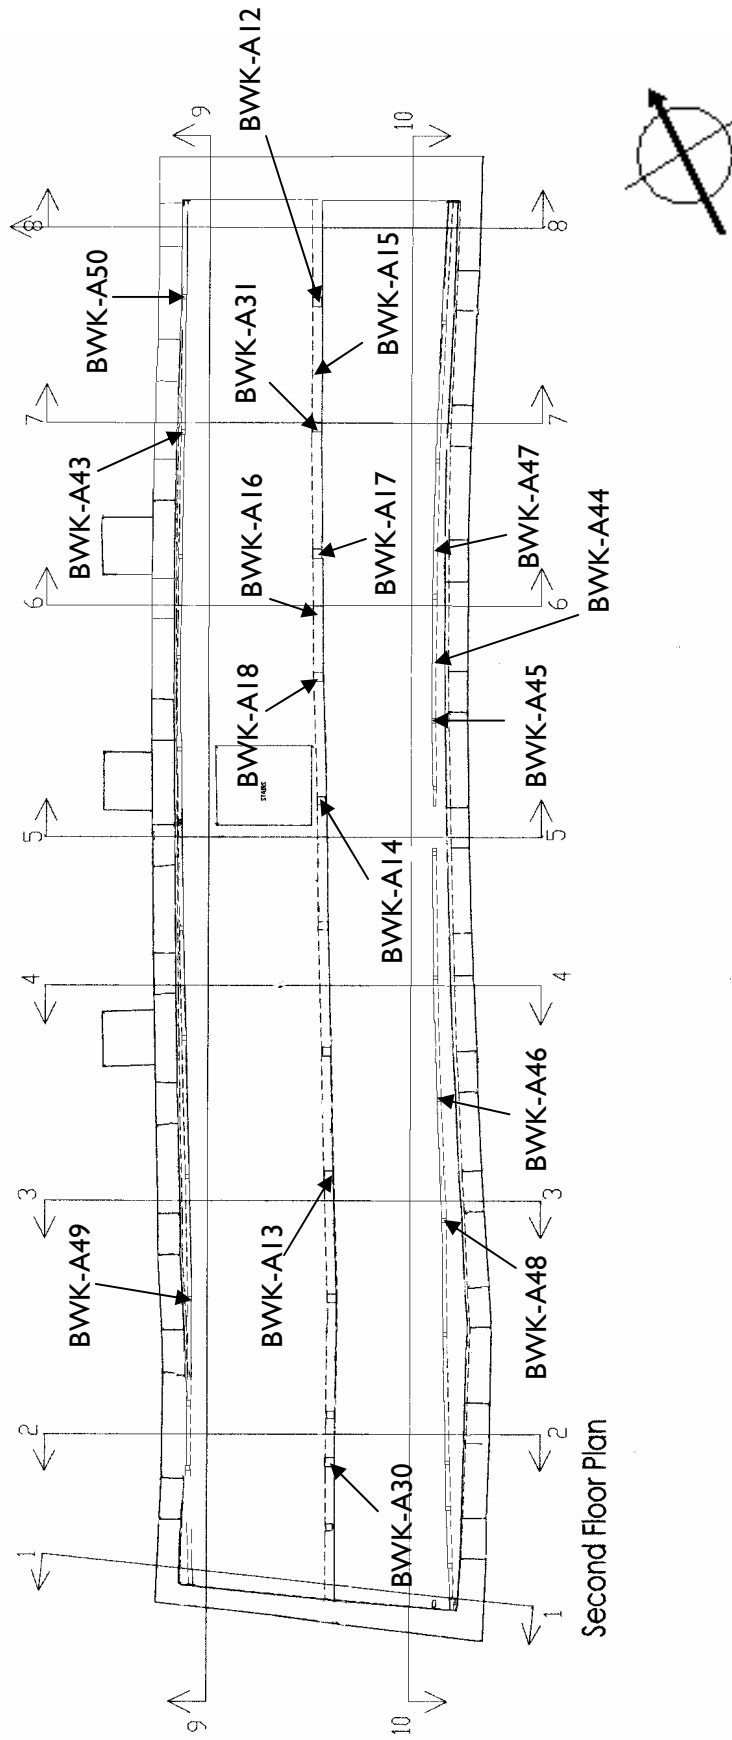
Second-floor plan showing the location of samples BWK-A12-18, BWK-A30-1, and BWK-A43-9 (Bain, Swan Architects)
